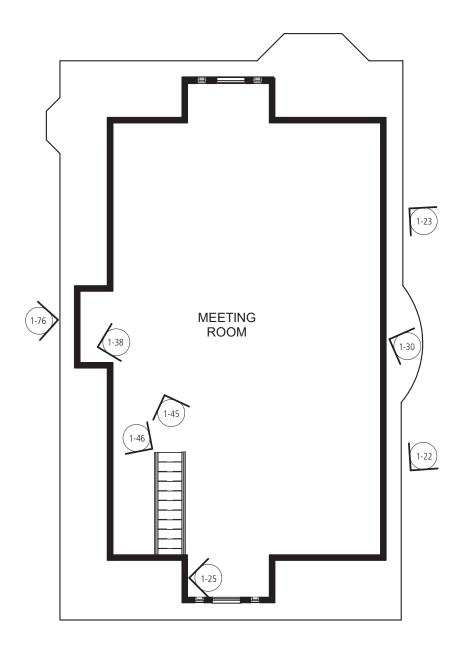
Second Floor Plan, 2020 (source: Ratio)
